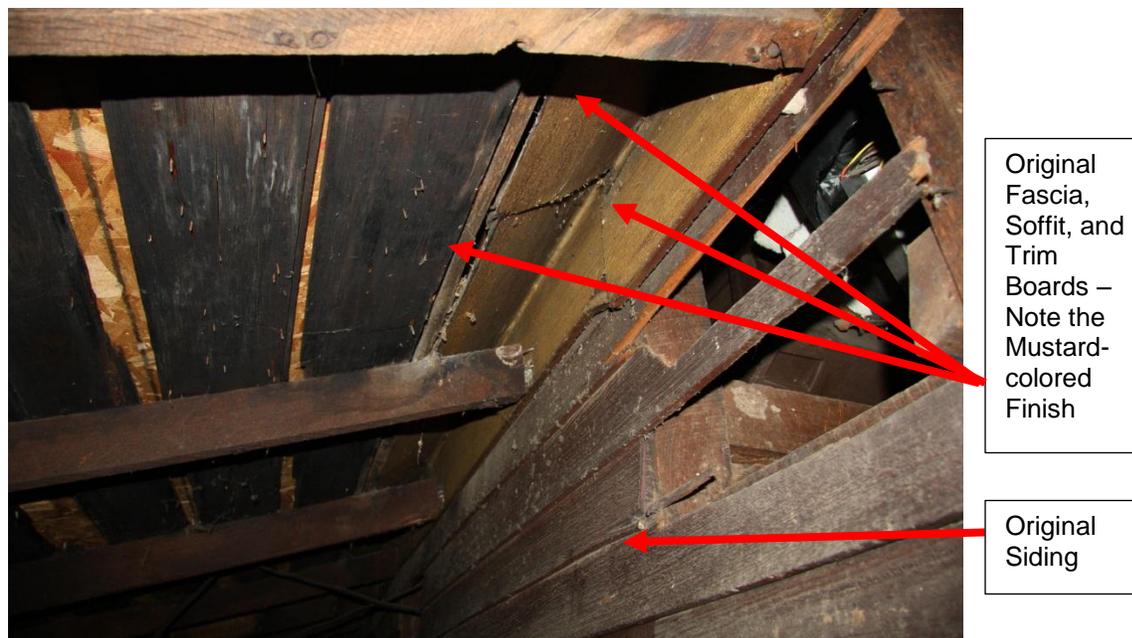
Ceiling and roof framing over Room 103, looking south. Note the original exterior siding in the right side of the photograph, as well as the original fascia, soffit, and trim boards. (SRJA 2011)
